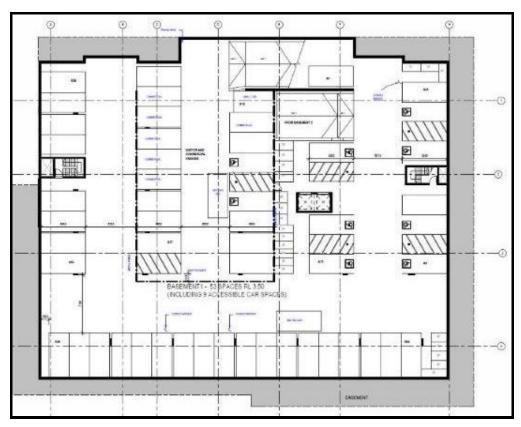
Proposed Upper level Basement (Source: Brewster Murray, 13/10/2017)
